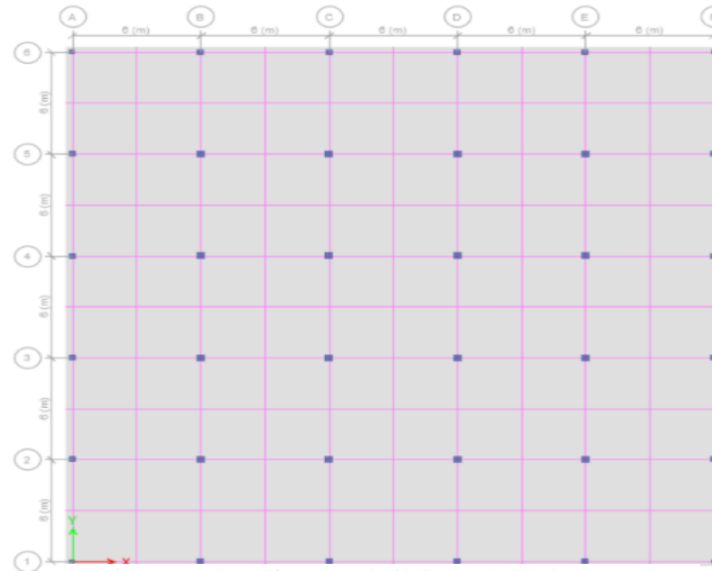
Plan of 8-story building (Flat slab/ Type B)
